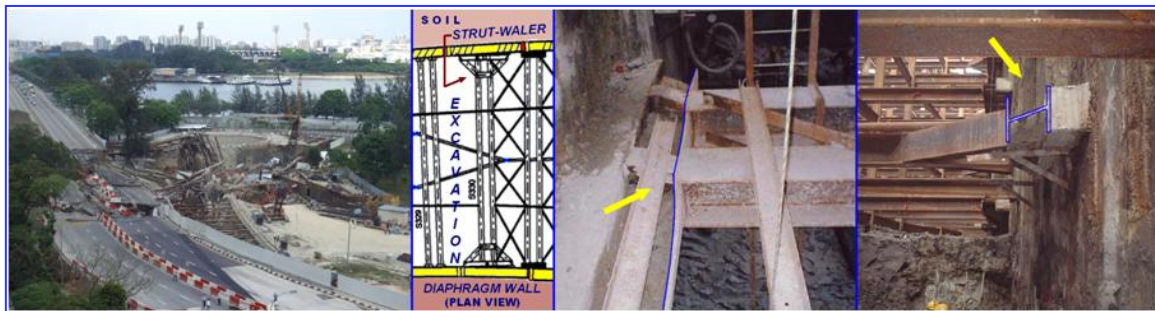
Nicoll Highway Collapse, *Left* – General View, part plan, *Right* – Buckled walers
